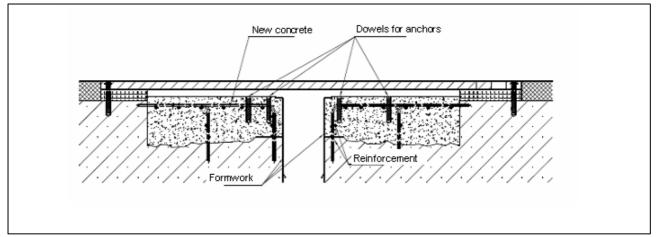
Construction Step 3: Placing of reinforcement and pouring of concrete
